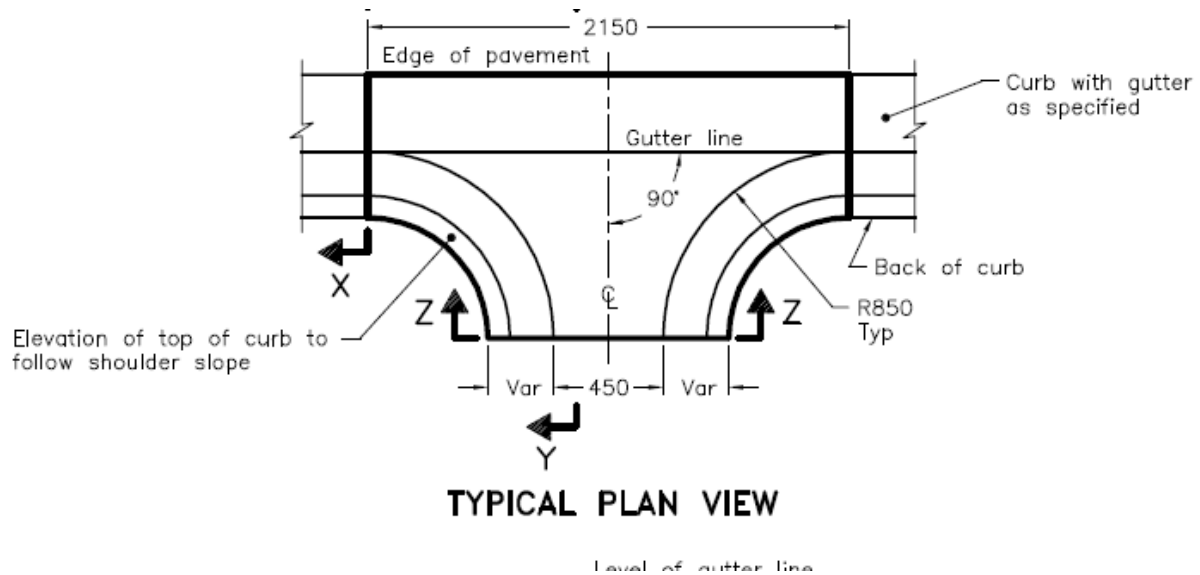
Concrete Outlet for Concrete Curb with Gutter-Ontario
